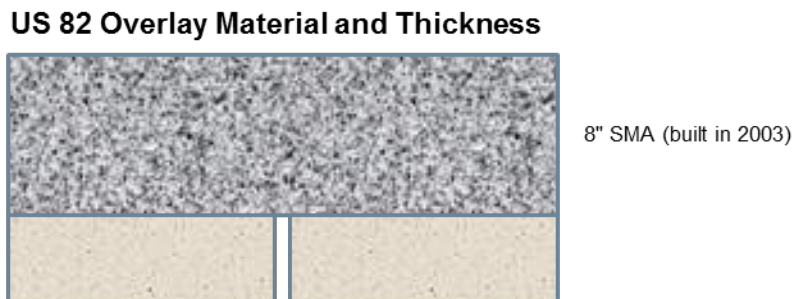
Schematic Diagram of US 82 Pavement Structure.
